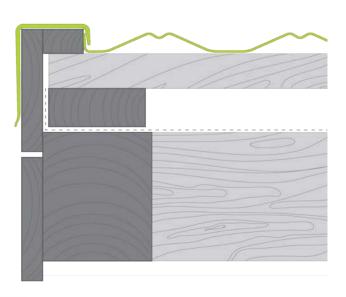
INSTALLING TILES AT FASCIA BOARDS - SECTION
